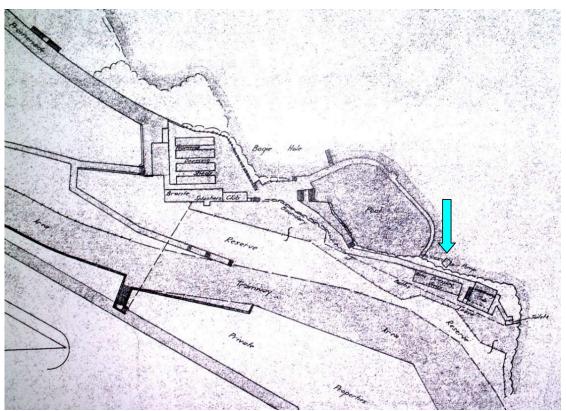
Existing site plan of the Bronte Ocean Pool complex prior to renovation works undertaken c.1970. The pumphouse structure is arrowed, interestingly shown without the concrete platform on which it would appear to have always stood. Source: Waverley Local Studies Library.
